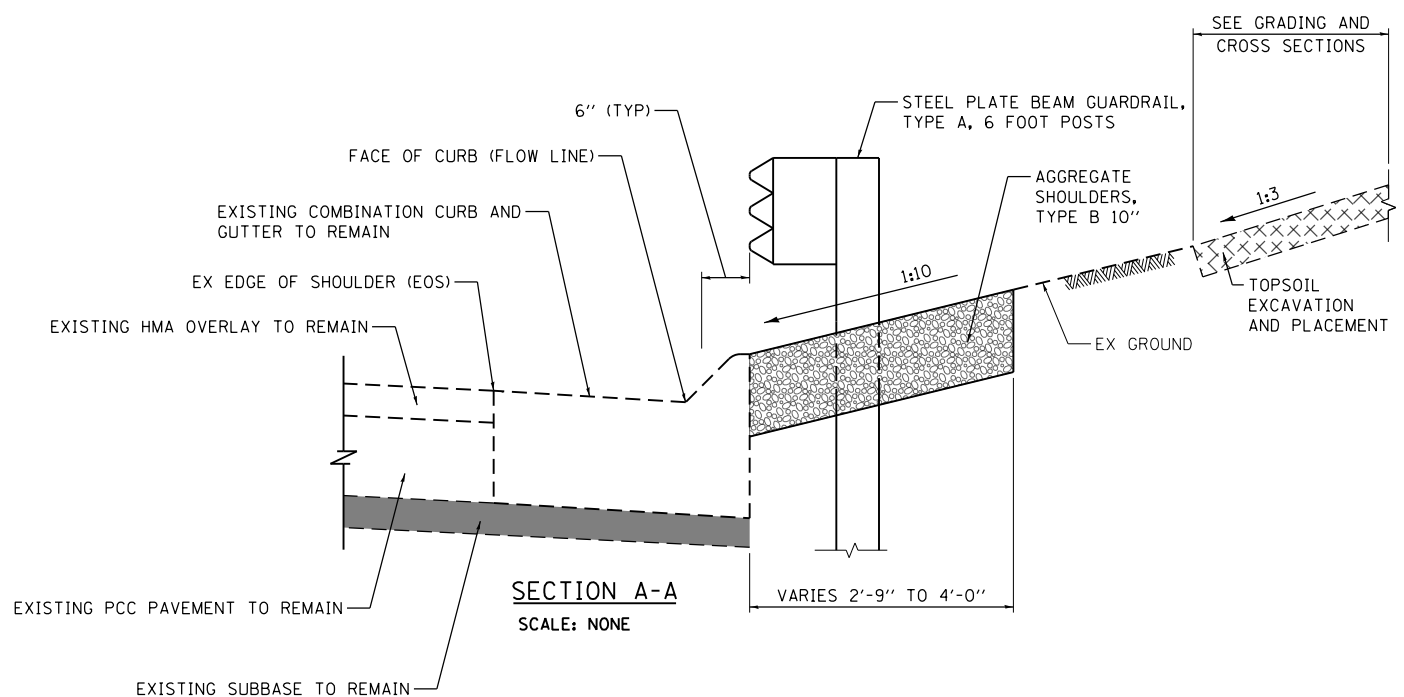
DETAIL: ROADWAY GRADING JACKSON BOULEVARD
